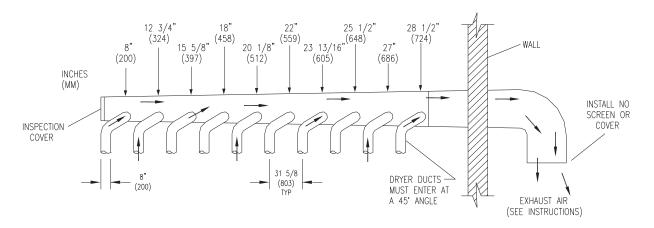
Dryer Exhausting Using A Main Discharge Duct.
